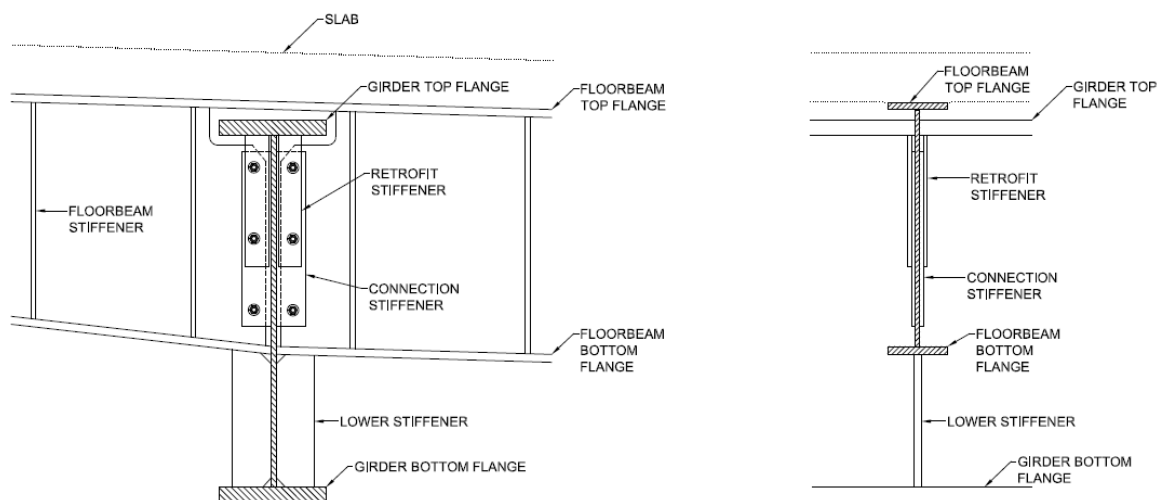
Typical Retrofitted Connection of Floor Beam to Girder
